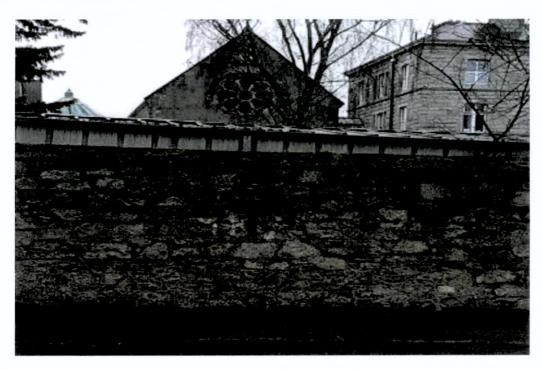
Perimeter rubble wall on Milltown Road with Chapel, stained glass window and Milltown Park House in background
